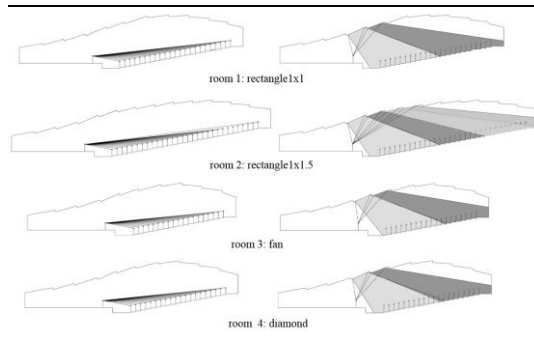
Floor Slopes and Ceiling Ray Analysis of Designed Rooms [8]
